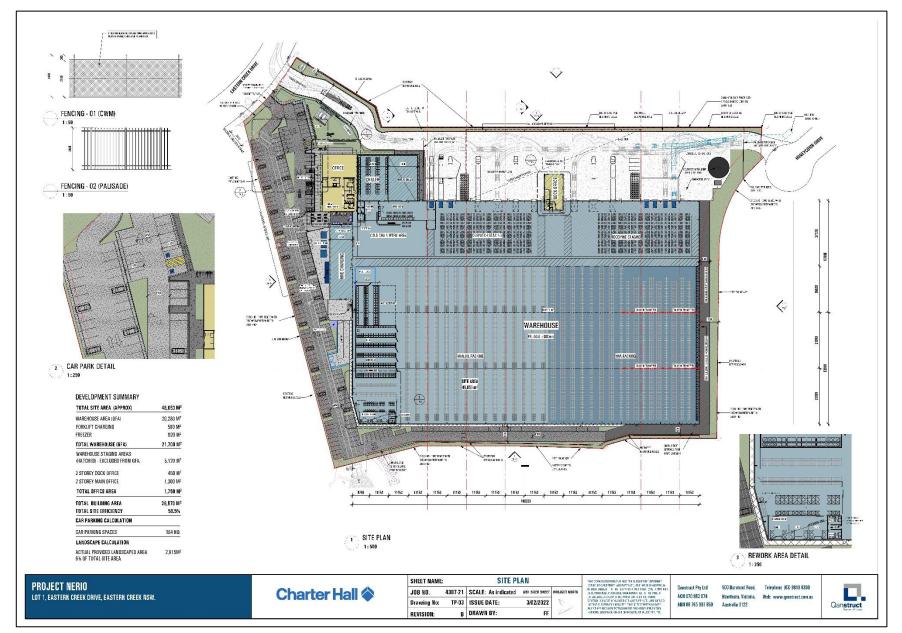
General arrangement plan for the proposal. NB north to right of page.
